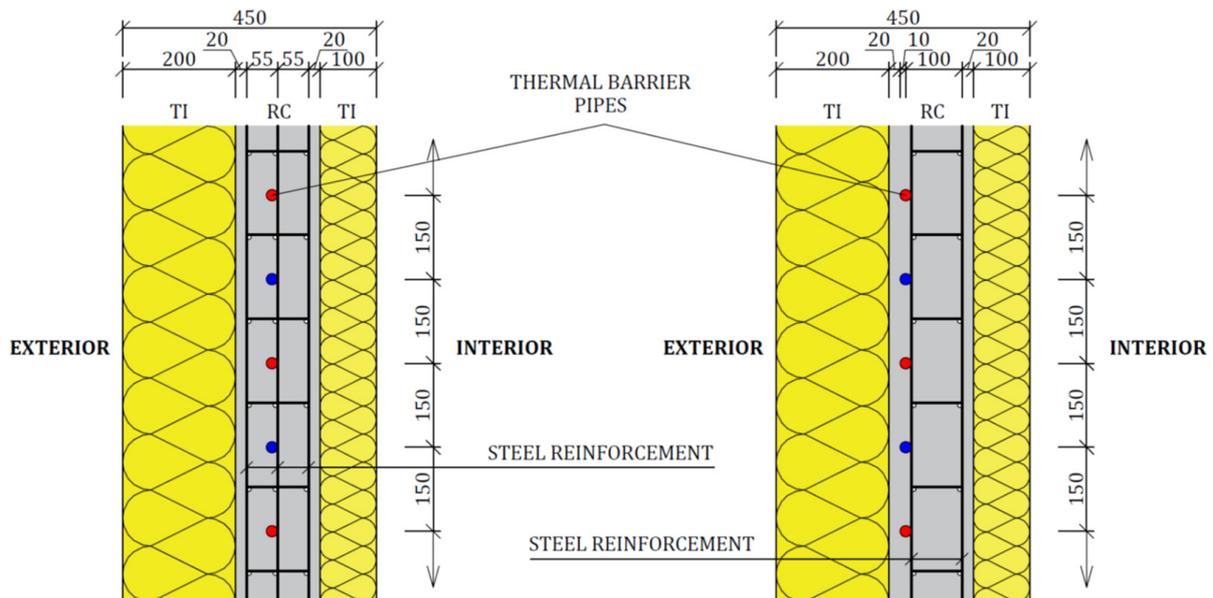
Principle of thermal barrier application in innovative panels (left—thermal barrier pipes are installed on the auxiliary reinforcement in the center of the panel structure; right—thermal barrier pipes are installed on the outer reinforcement of the panel structure). The colored points (red and blue) in the picture are thermal barrier pipes [1].
